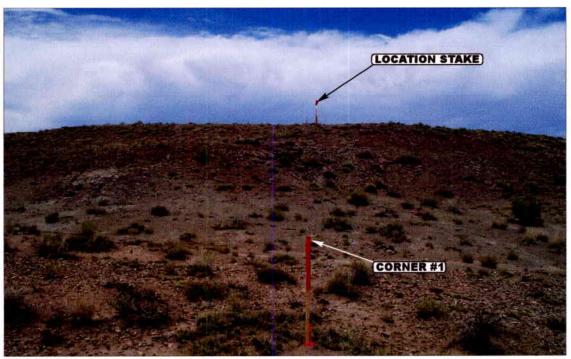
PHOTO: VIEW FROM CORNER #1 TO LOCATION STAKE
